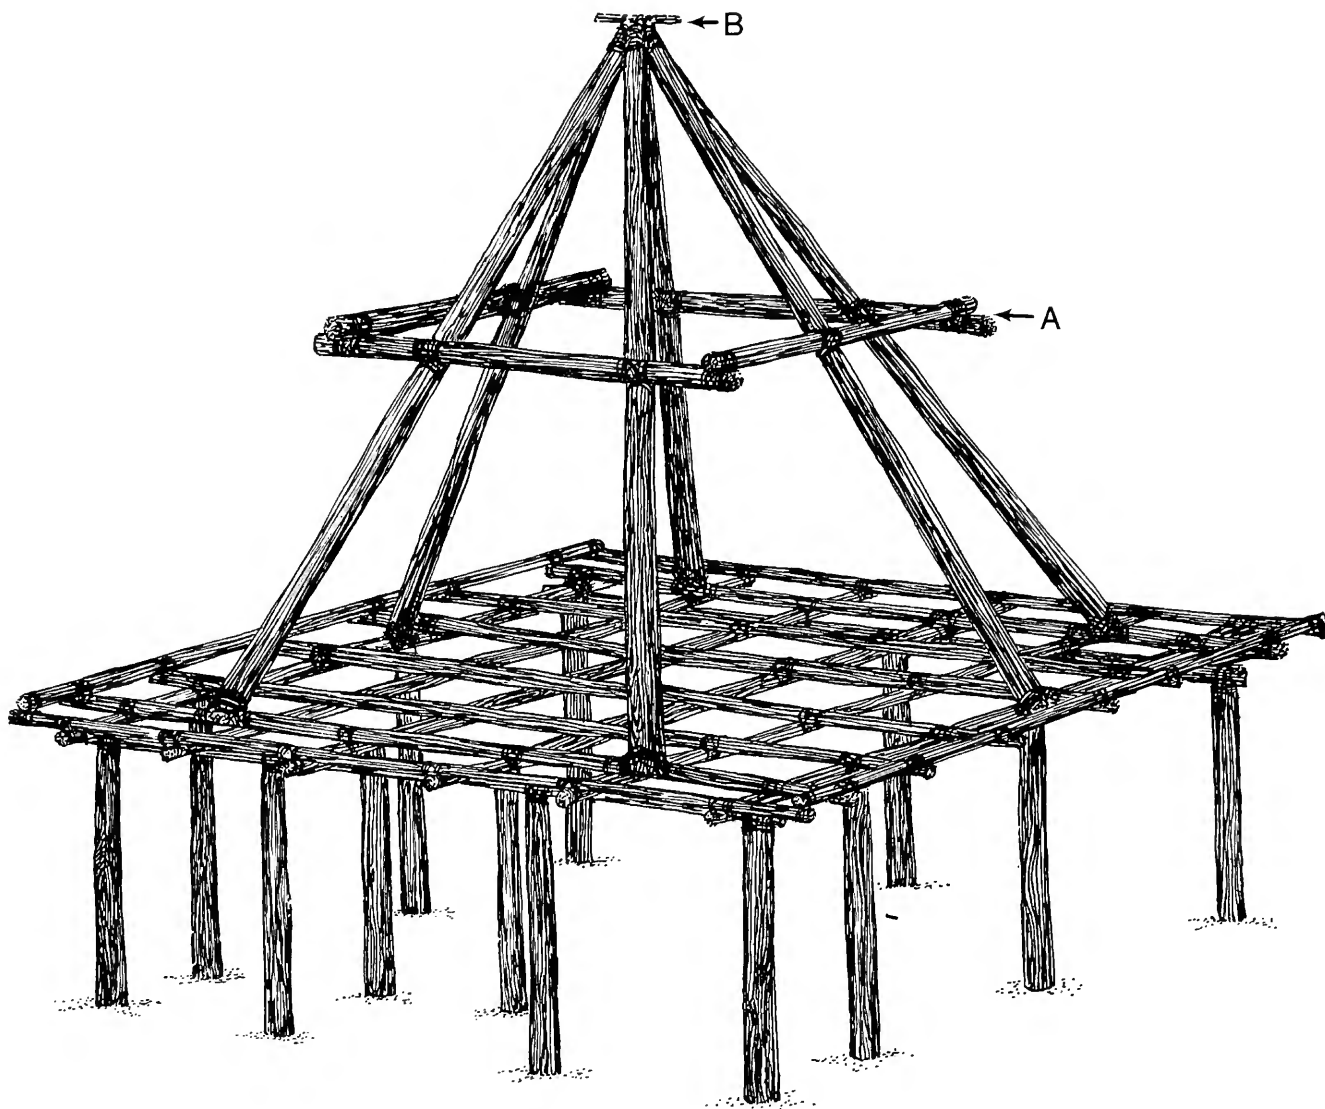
Elevation of house frame: A, purlin, moriyo, B, cross piece, ka'. Four purlins are bound midway up the roof beams. The cross piece is tied to the apex of the A-frame.
